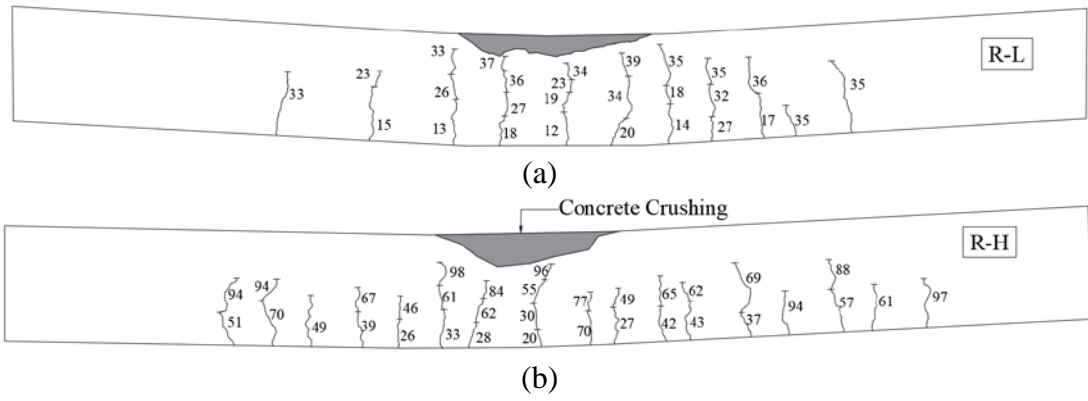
Reference specimens cracking patterns: a) R-L, and b) R-H
